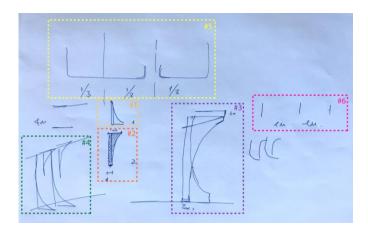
12. O<sub>a</sub>L sketches for the façade elements. #1 an element section for the façade.
